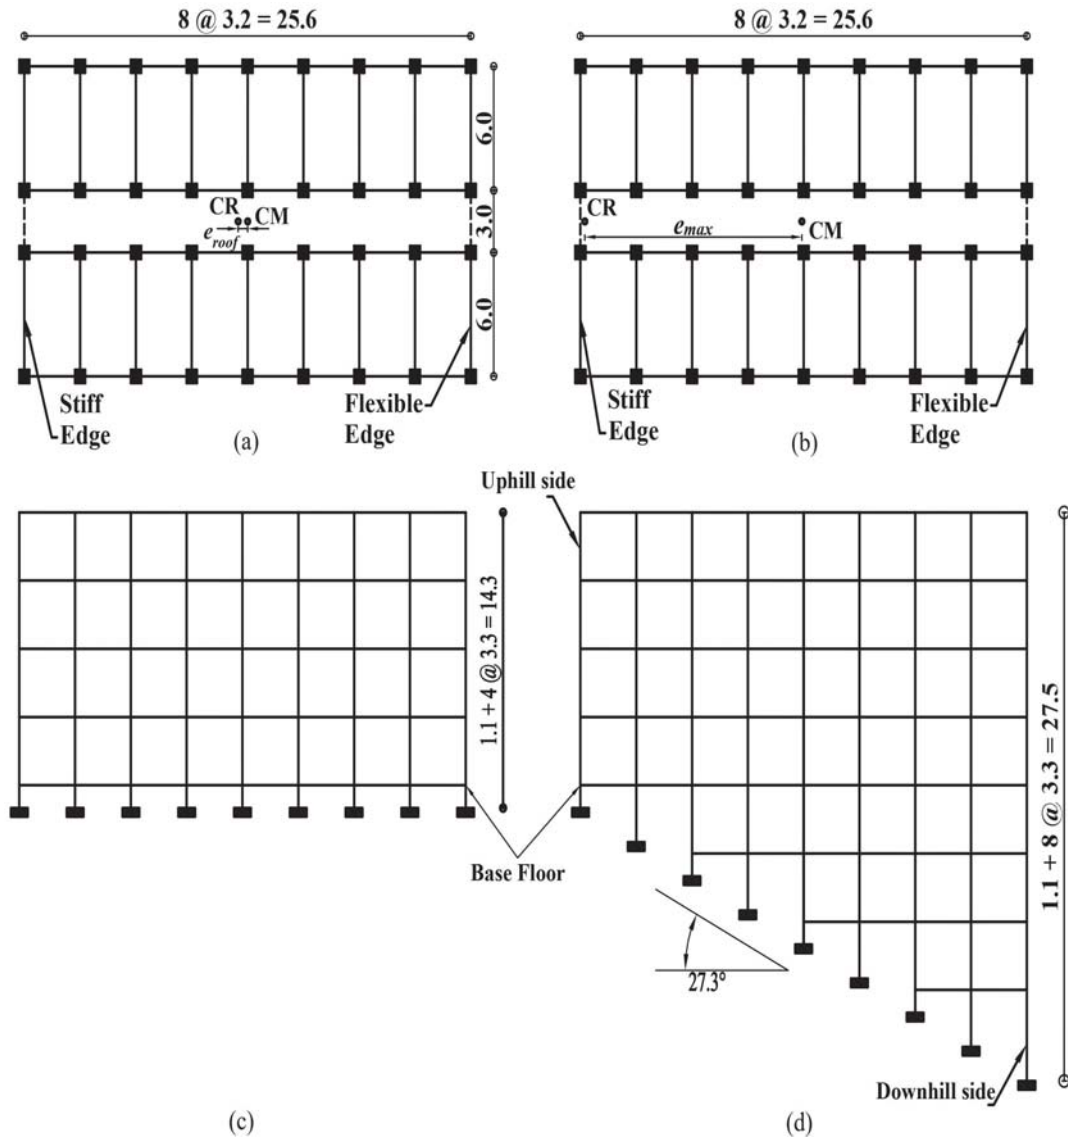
Typical plan and elevation layouts: (a) floor plan of the step-back building, at the roof level, (b) floor plan of the step-back building, at the base foundation level, (c) elevation of the reference regular building, and (d) elevation of the step-back building, in the direction along the slope. The dashed lines define the boundary of the floor slab. CM and CR denotes the locations of the center of mass and center of rigidity in the floor plan. All dimensions are in meters.
